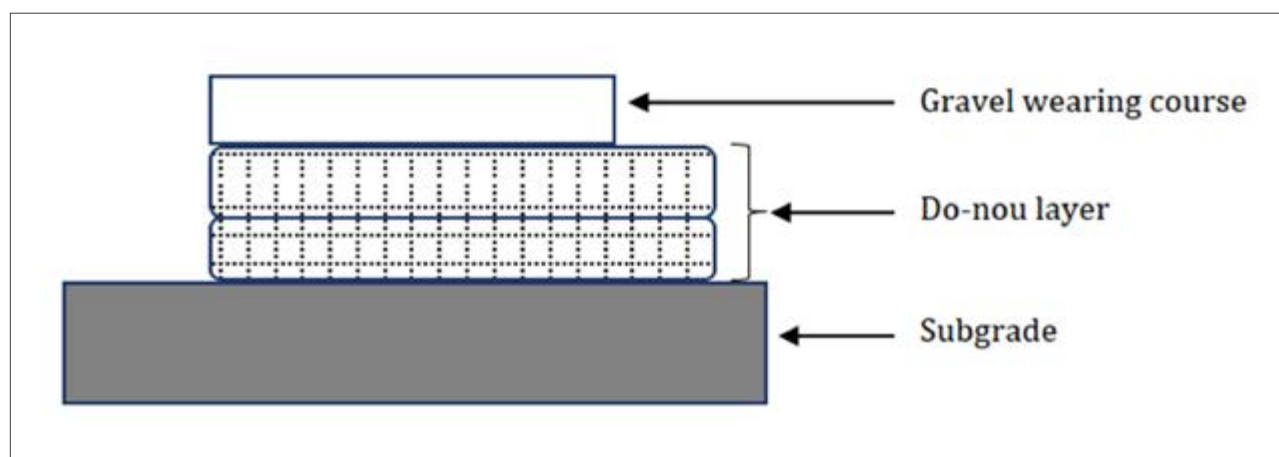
Typical Do-Nou Cross Section for Improvement of Soft Ground
